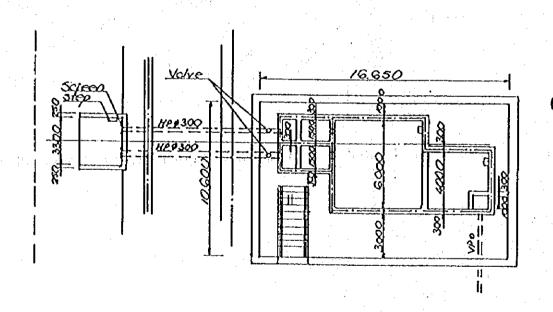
Plan & Cross Section of Leachate Pump Station
